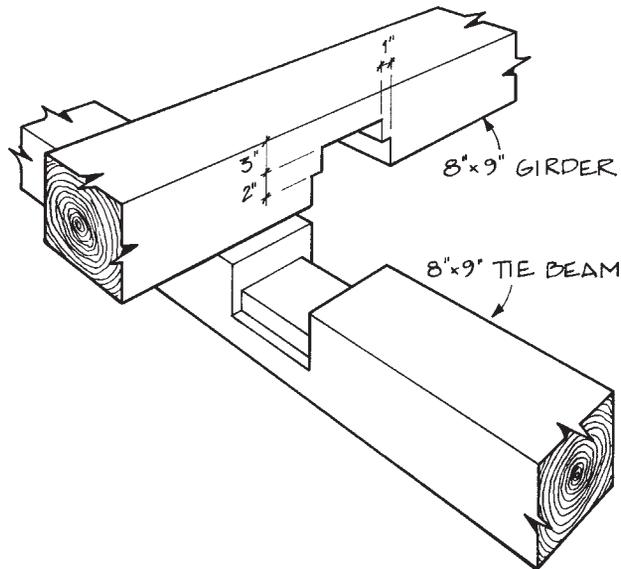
Strengthened halving found in the attic floor of the 1783 Quaker Meeting House, Adams, Massachusetts. The 8x9 girder ran longitudinally and carried floor joists on both sides.
